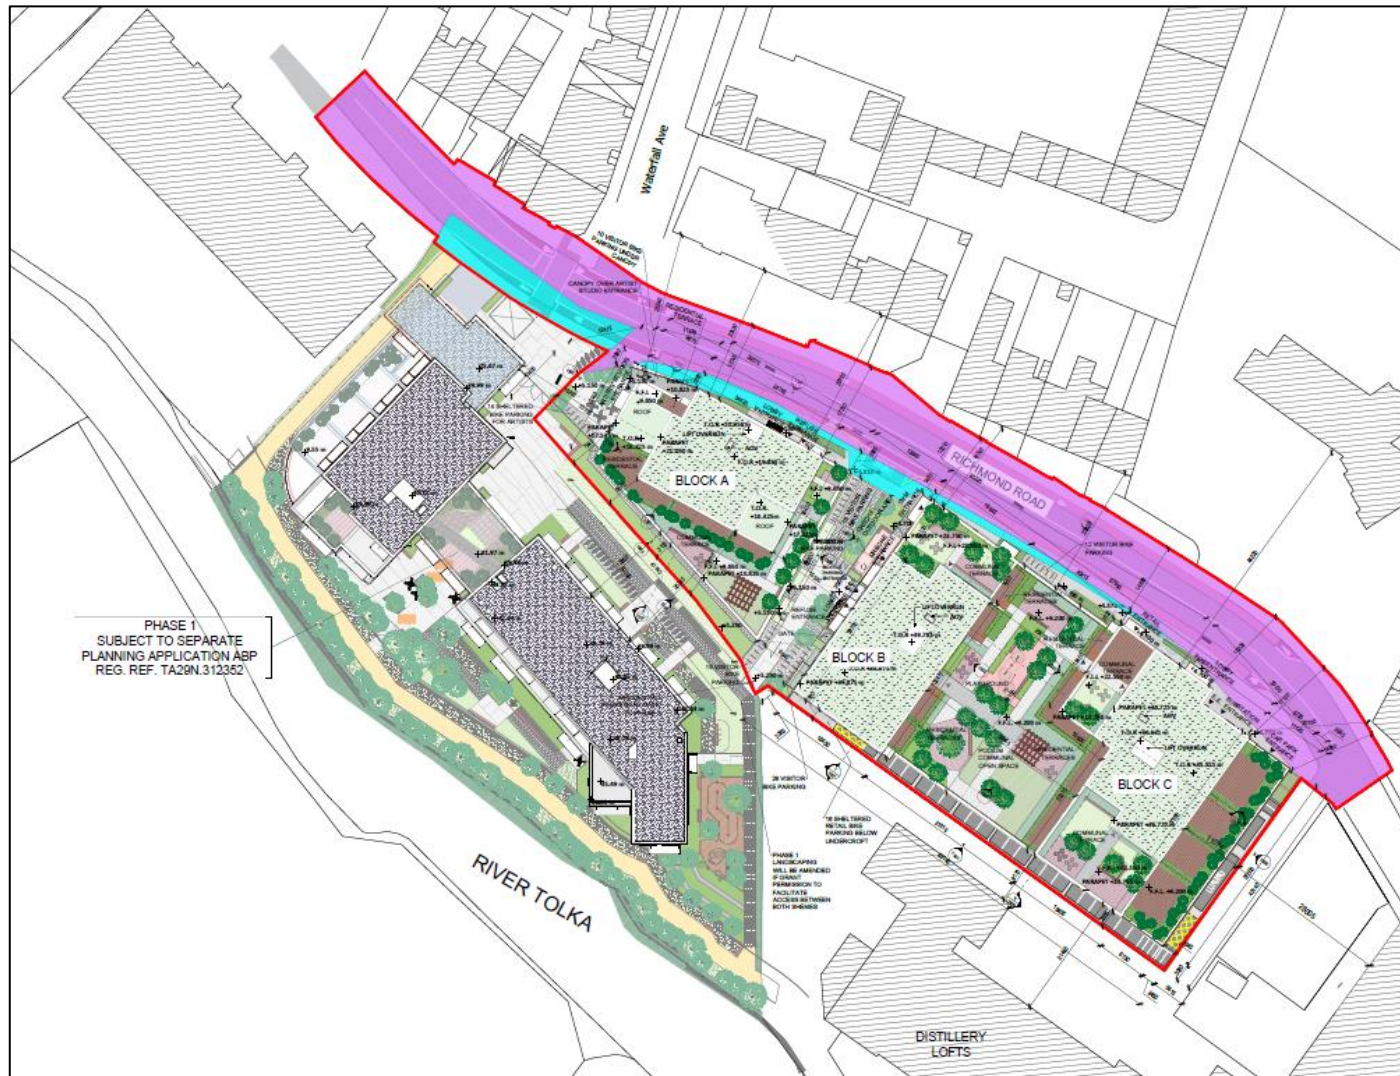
Proposed Site Layout (RKD Drwg: 22001-RKD-ZZ-00-DR-A-1002A, Rev: P5, Dated January 2023)
